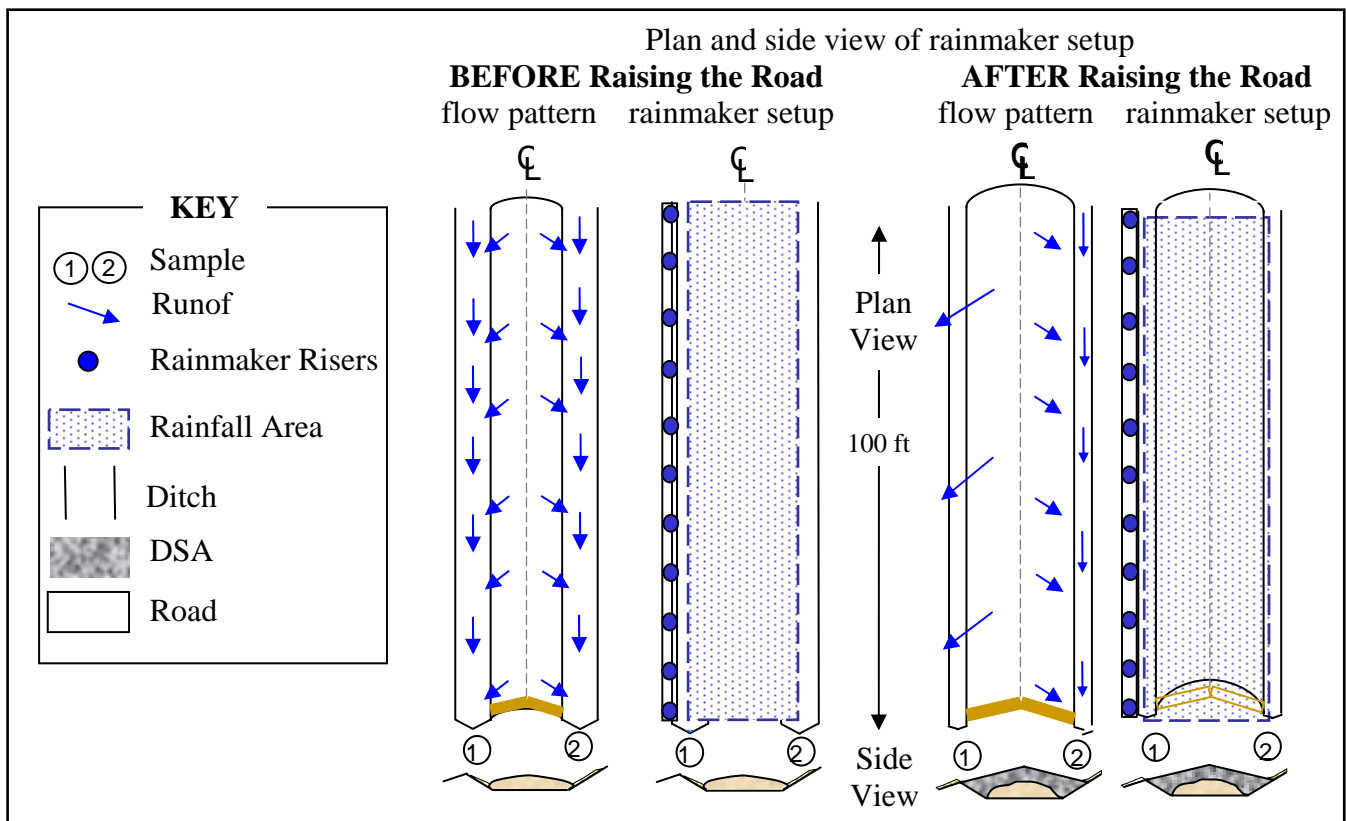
Aerial and plan view of rainmaker setup for Raising Road Profile
